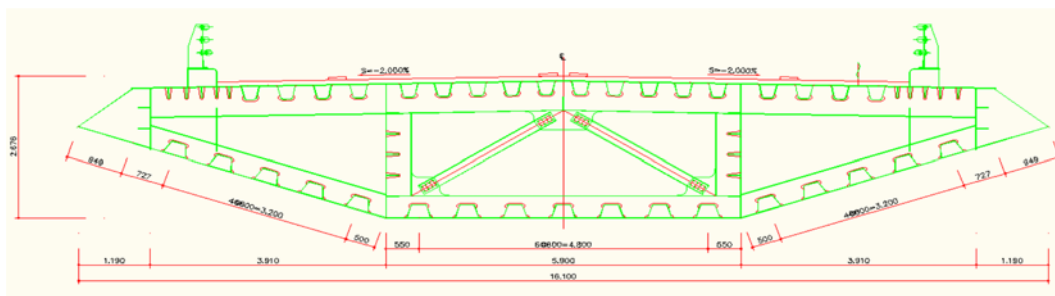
Cross-section of Deck of the Asymmetric Bridge
